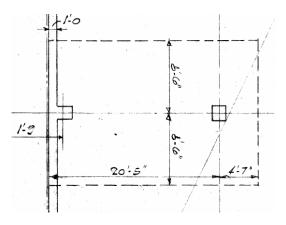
Typical Combined Footing Shown Dashed in Plan, from S1
